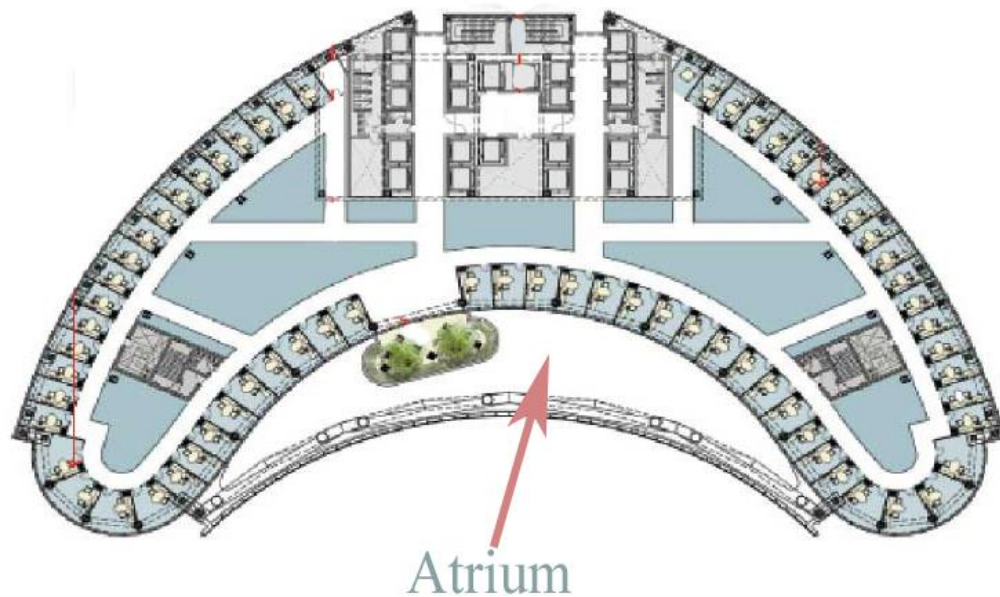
Ground floor plan showing the atrium space created south of the building [55]
